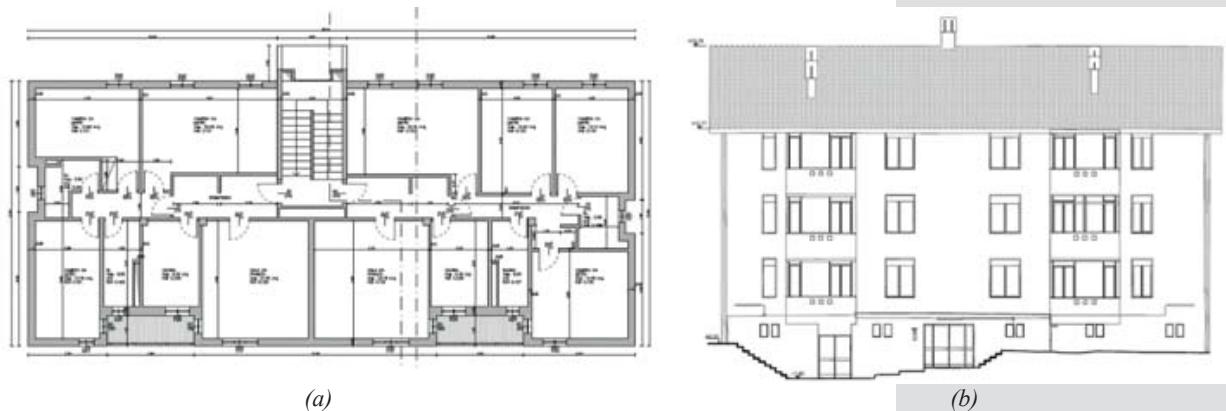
a) Italian demo building typical plan and b) Italian demo building South façade before the retrofitting.
